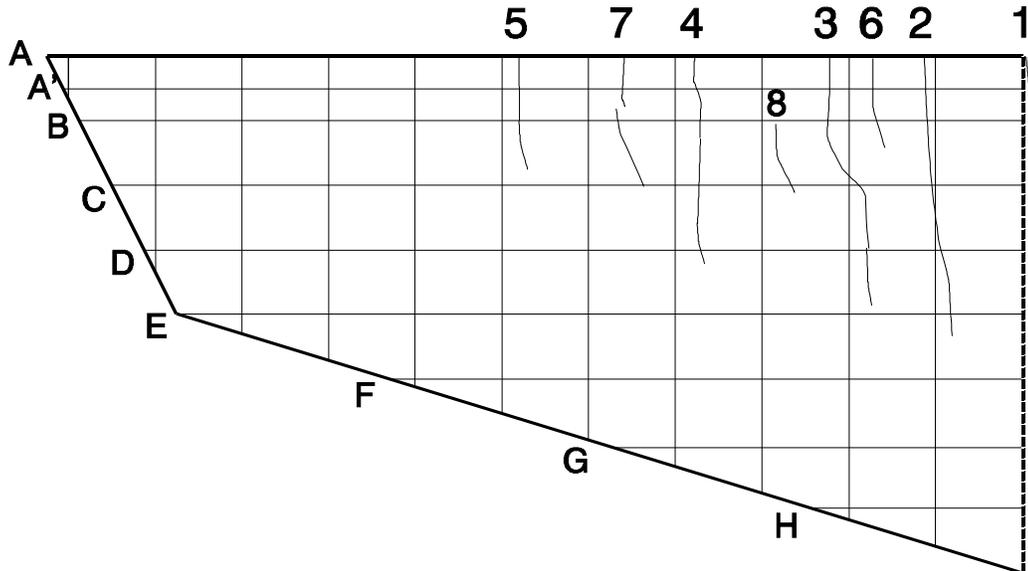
POJ-RC-100 cracking pattern on south face of overhang at service load
